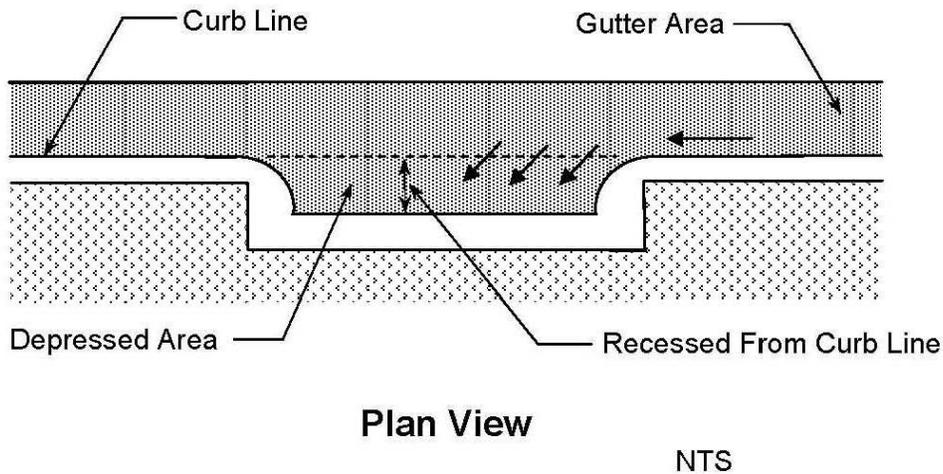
Recessed Curb Inlet Diagram
